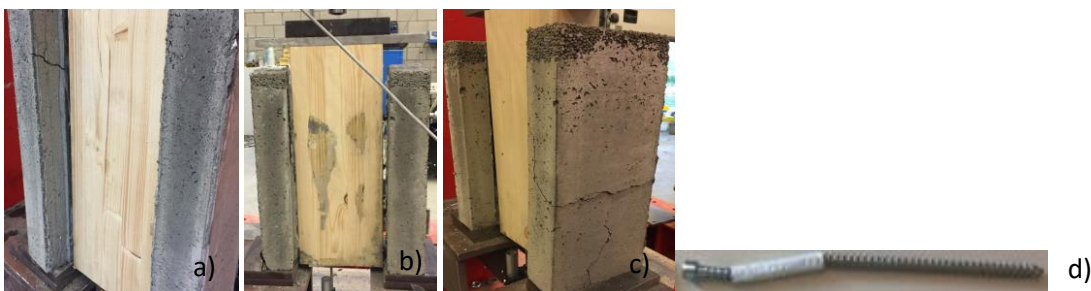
Failure of specimens with screws installed at 45 degrees to the timber grain (from left to right) (a) Concrete failure (b) timber withdrawal failure (c) crack pattern of the loaded specimen (d) plastic hinge formation in a failed screw
